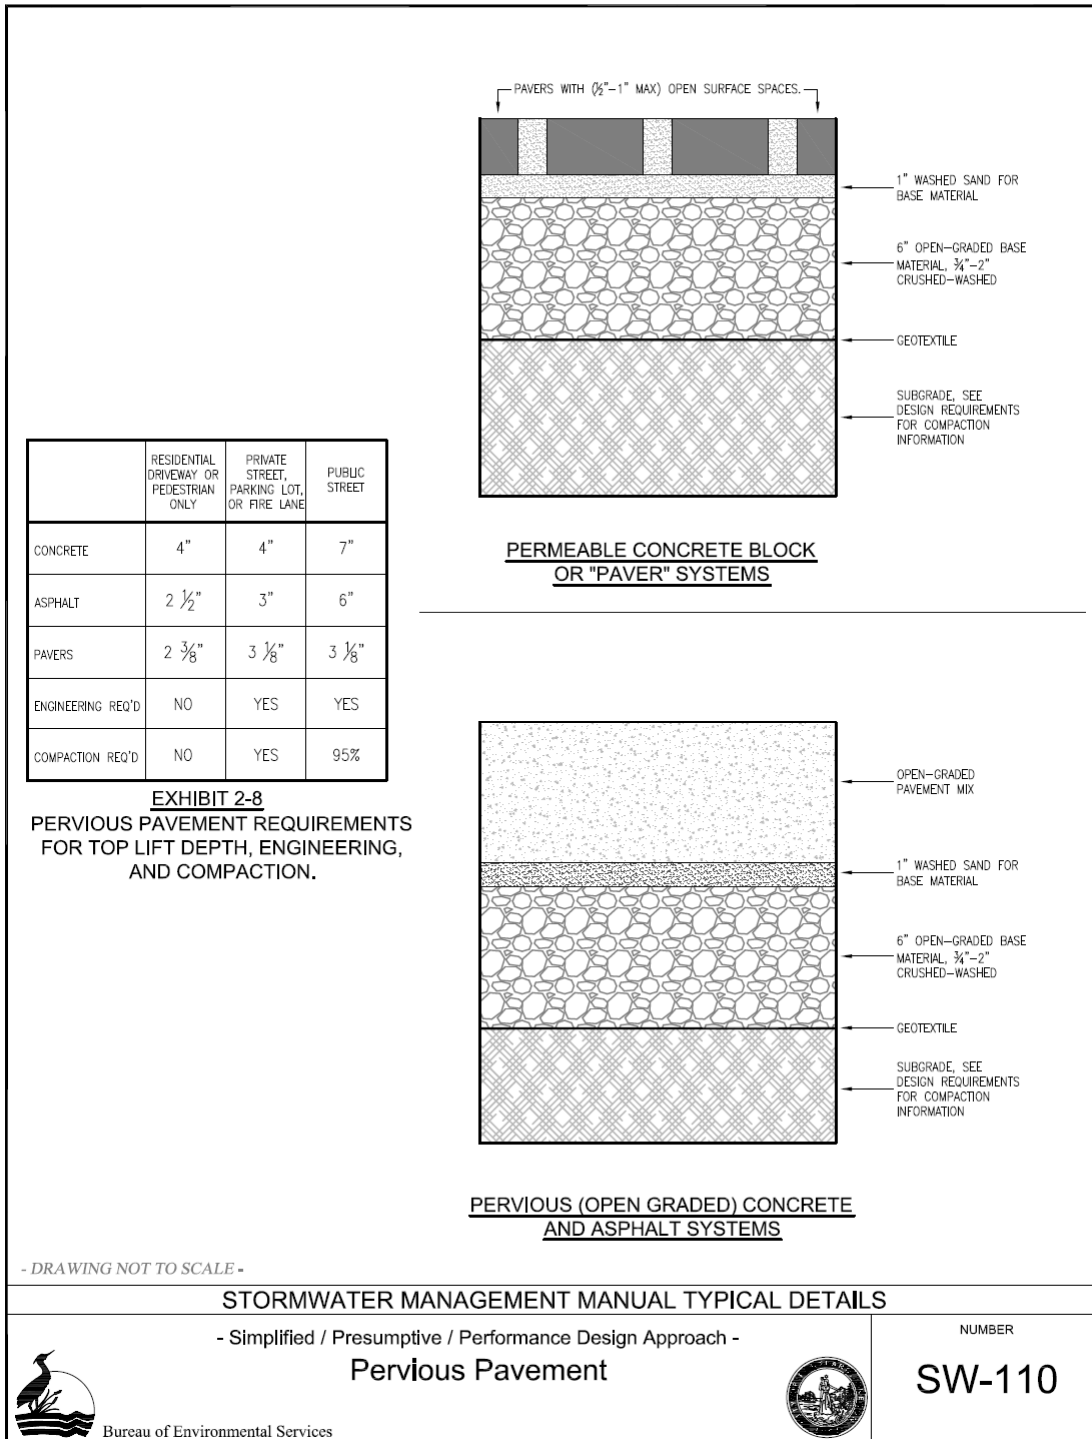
Porous Pavement Schematic from Portland Stormwater Manual (2008)
